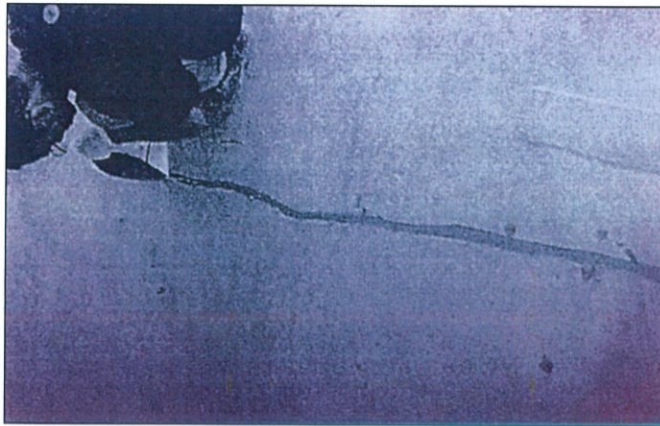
StoPox EPG resin grout is pouring in the crack line
